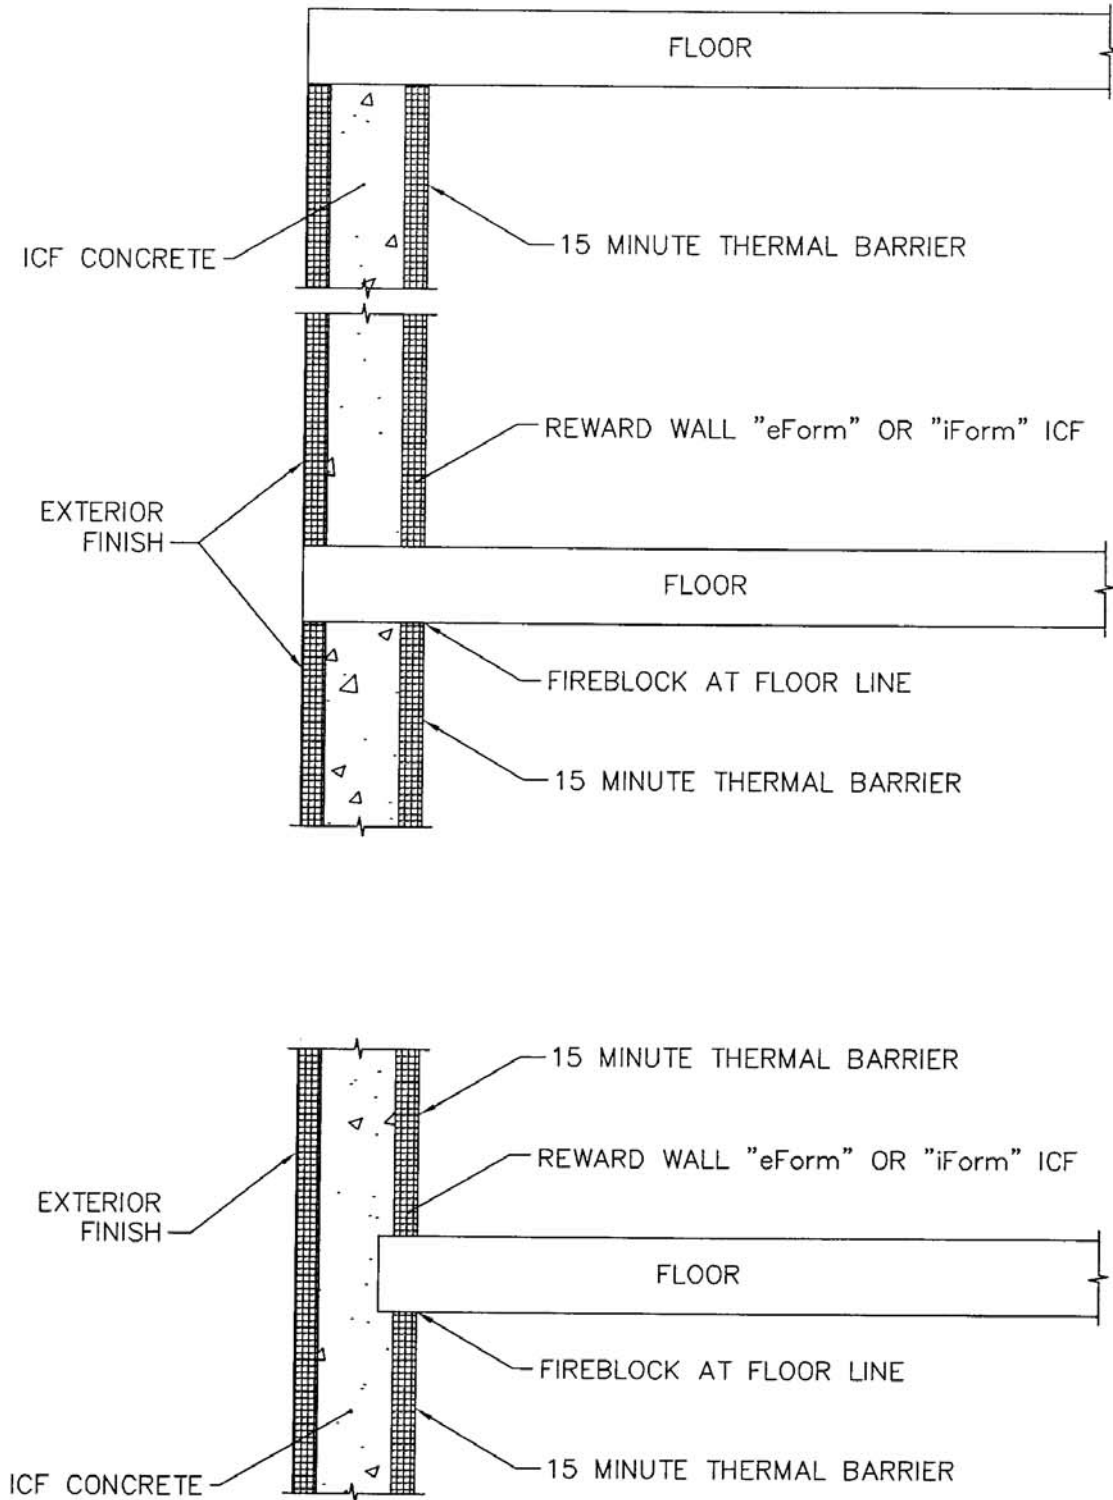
TYPICAL FLOOR-WALL DETAIL FOR NONCOMBUSTIBLE CONSTRUCTION
